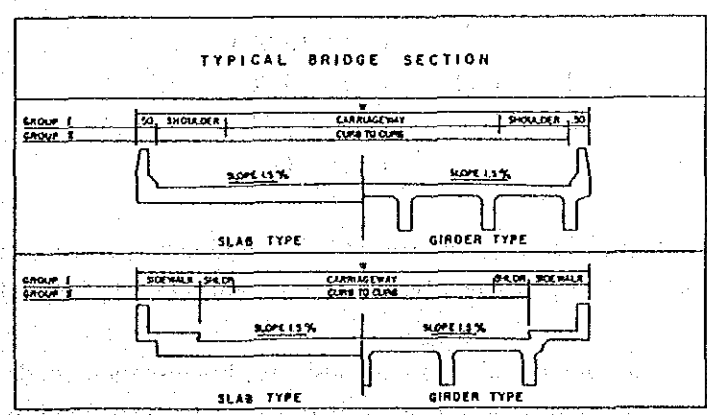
TYPICAL DESIGN OF BRIDGES
